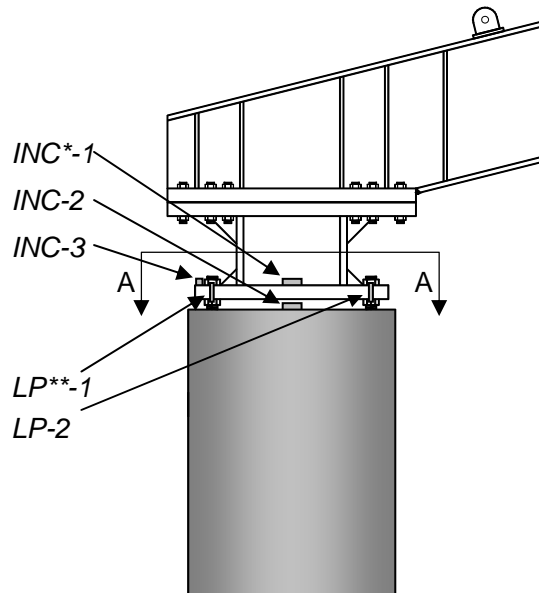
Connection of 6 Extreme Anchor Bolts to Base Plate
